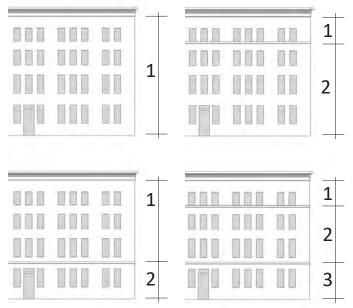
C.1.b: FAÇADES divided into 1, 2, and 3 horizontal layers
